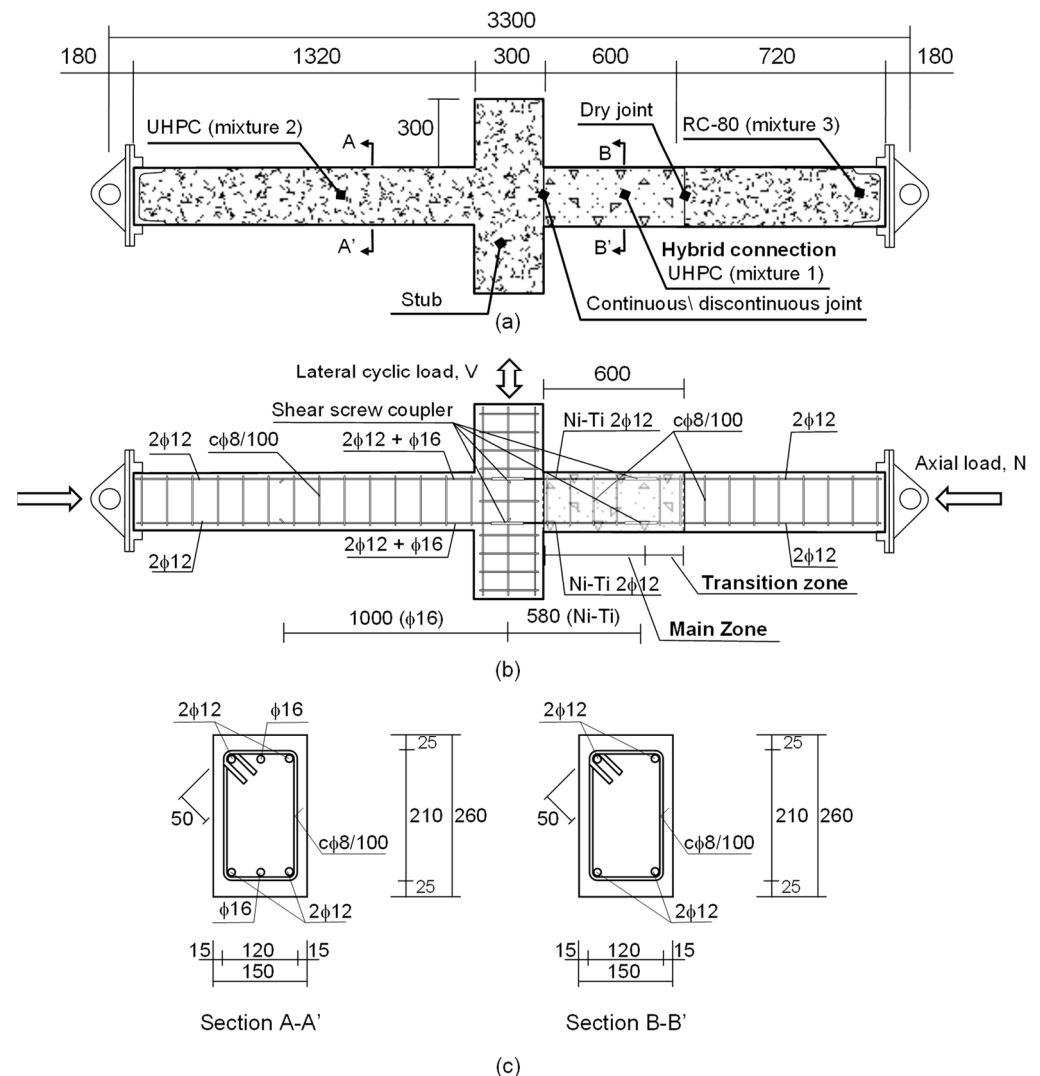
Specimen 1–4 details: (a) dimensions (unit: mm), (b) longitudinal reinforcement, and (c) cross-section details.
